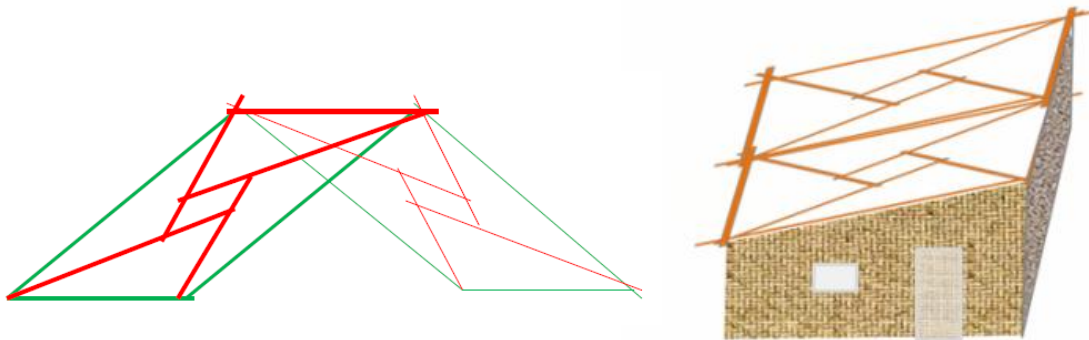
; Transitional roof to suit a double pitch and a single pitch roof.
